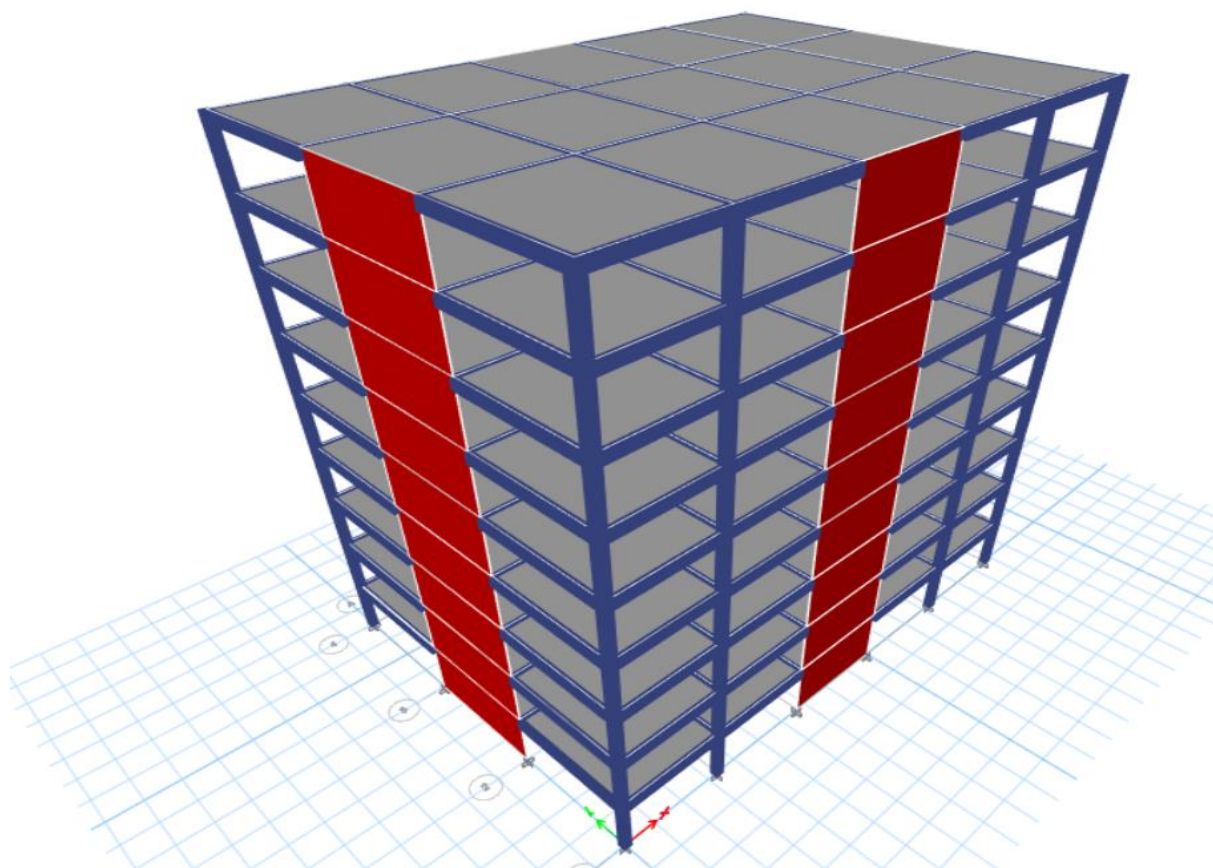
Elevation of the G+8 building with 0.56% and 0.67% structural wall plan density in X and Y-Direction respectively.
